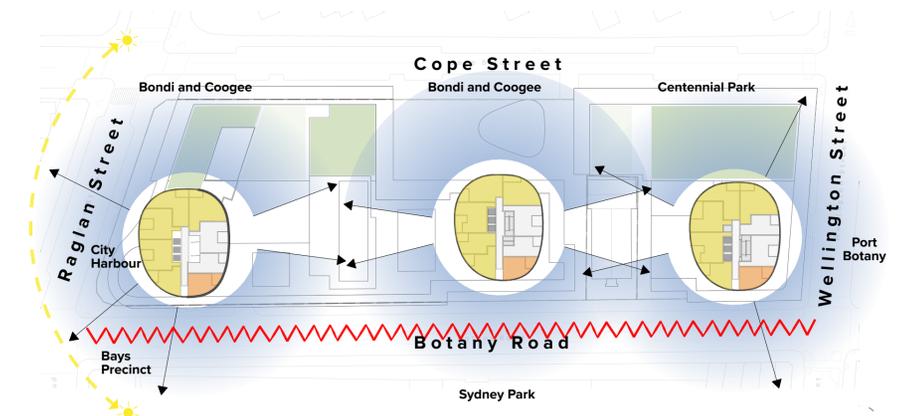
Solar access and outlook_Taller Buildings
